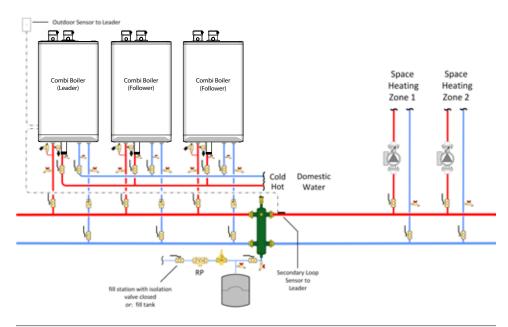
Typical Combi Boiler cascade piping – concept drawing. This drawing is only a simple schematic guide
